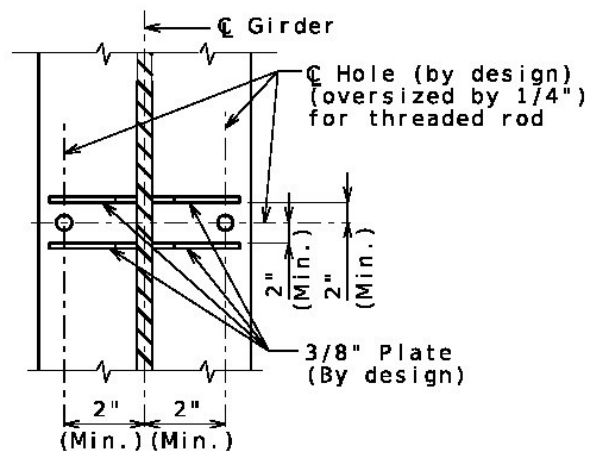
Longitudinal Restrainers (Intermediate Bents - Steel to Concrete Girders)
